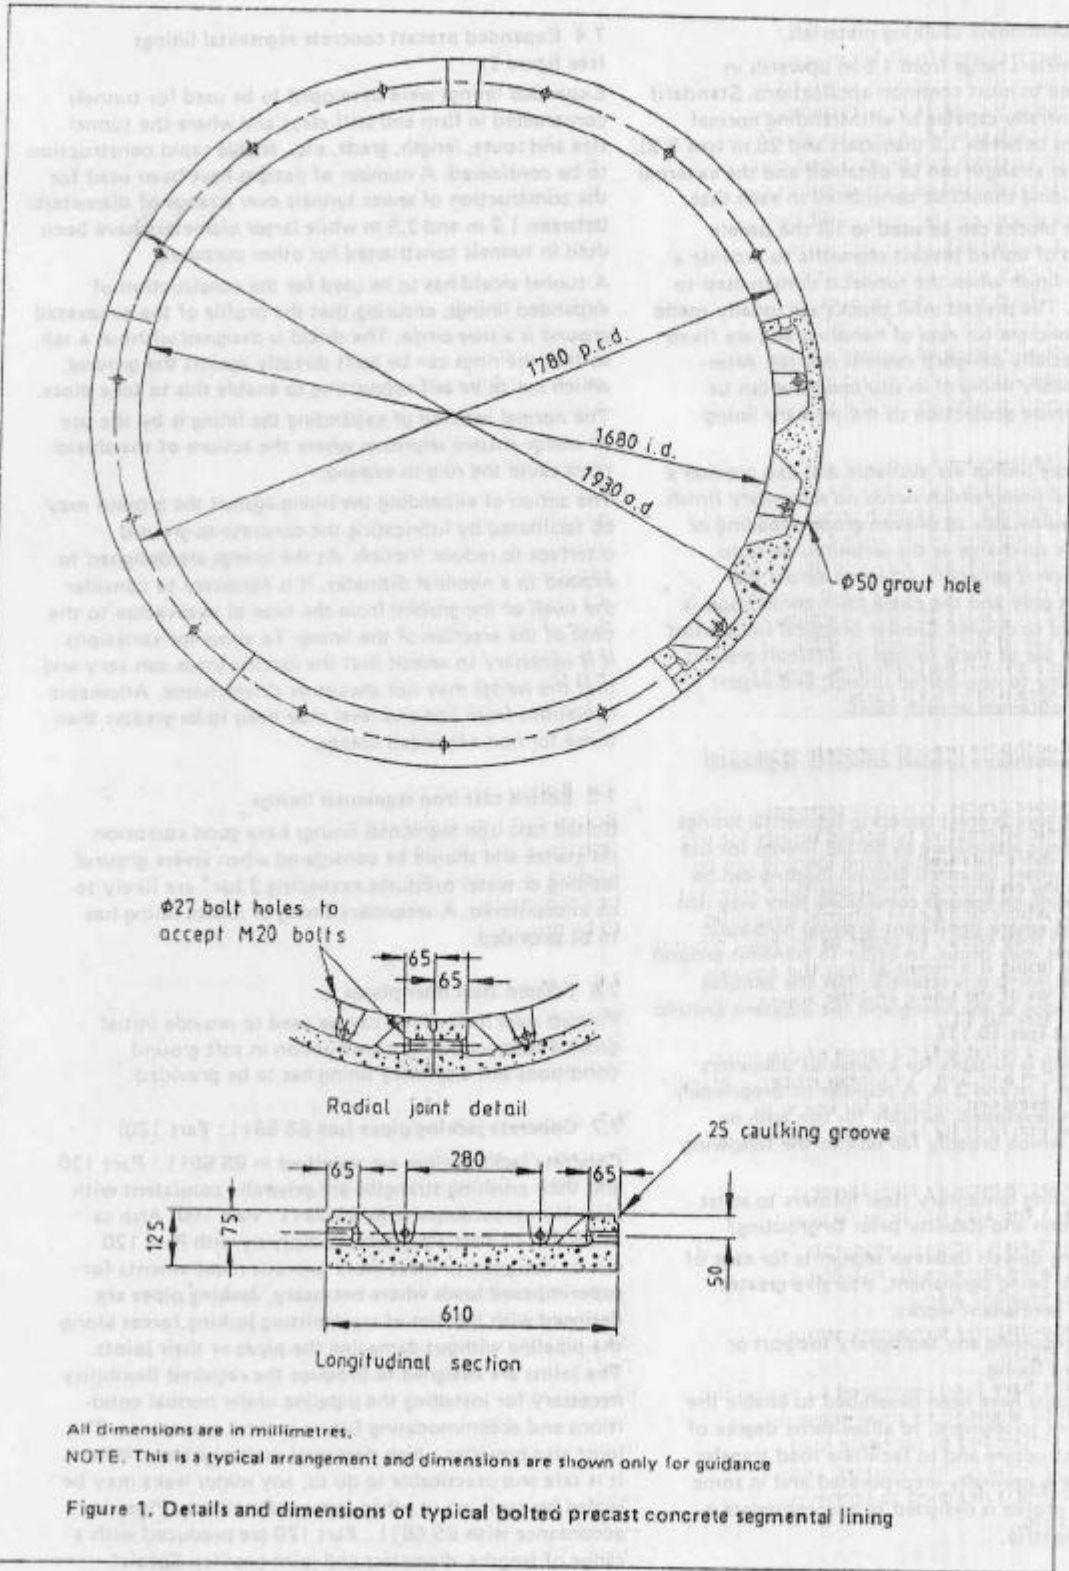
Details and dimensions of typical bolted precast concrete segmental lining
